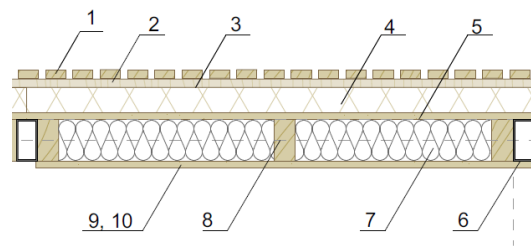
External wall structure - wood paneling: 1- Thermo-treated wood siding, 2- Anti-condensation sheet, 3- Support batten, 4- Rigid thermal insulation - polyurethane foam 60mm, 5- Chipboard, 6- Metal structure, 7- Rockwool thermal insulation 100mm, 8- Wooden structure, 9 – Vapor barrier membrane, 10-Gypsum wall board.
